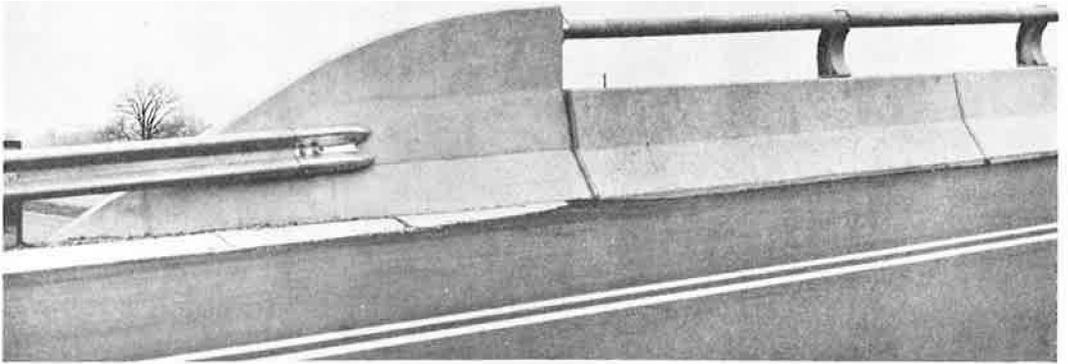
View of bridge rail end wall and blending of adjacent guardrail.
